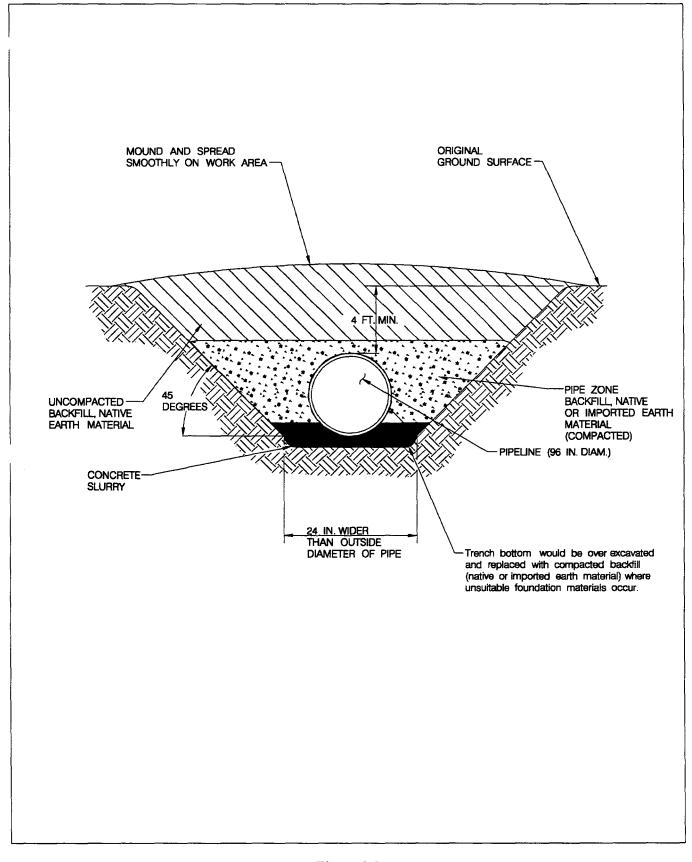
Schematic Drawing of Typical Pipe Trench Cross Section
